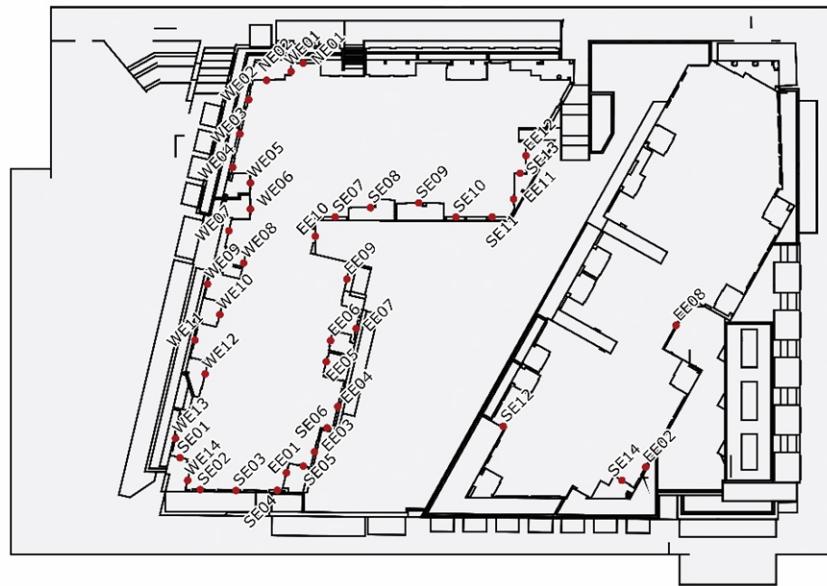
Layout of Pressure Sensors – Level 4 Plan
